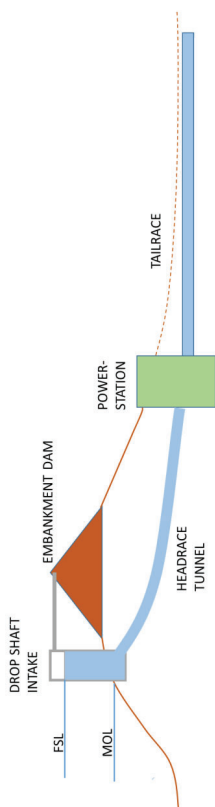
Principal sketch of intake and powerhouse connected with a tunnel
